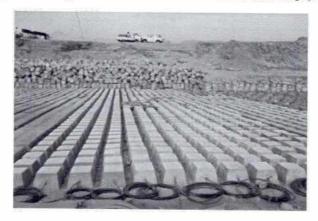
Cable connected in-situ built concrete block mattress (launching apron)
